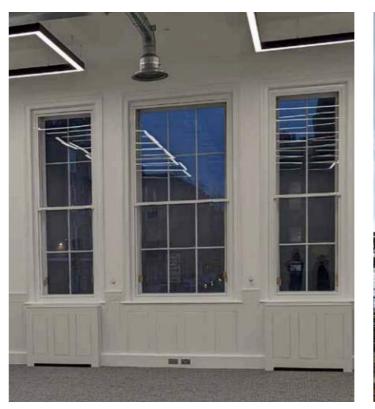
Example of existing secondary glazing applied to 163 ground floor
